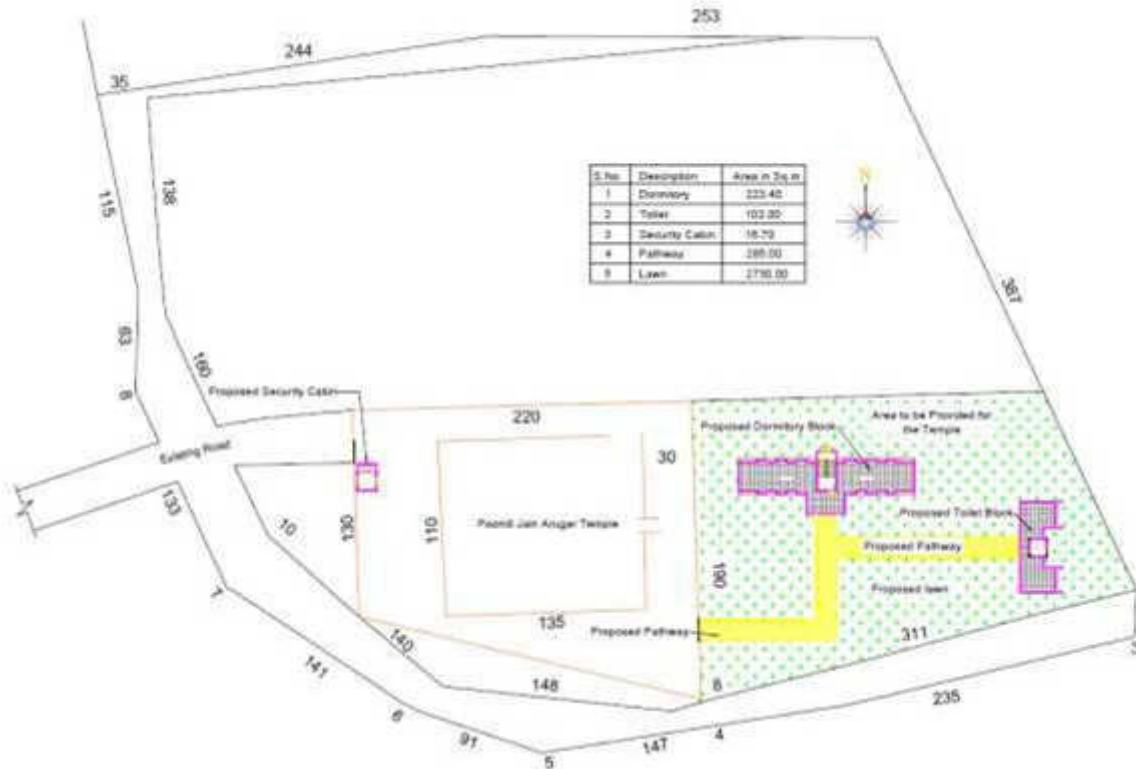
(g) Proposed site plan for subproject components – Poondi Arugar Temple
